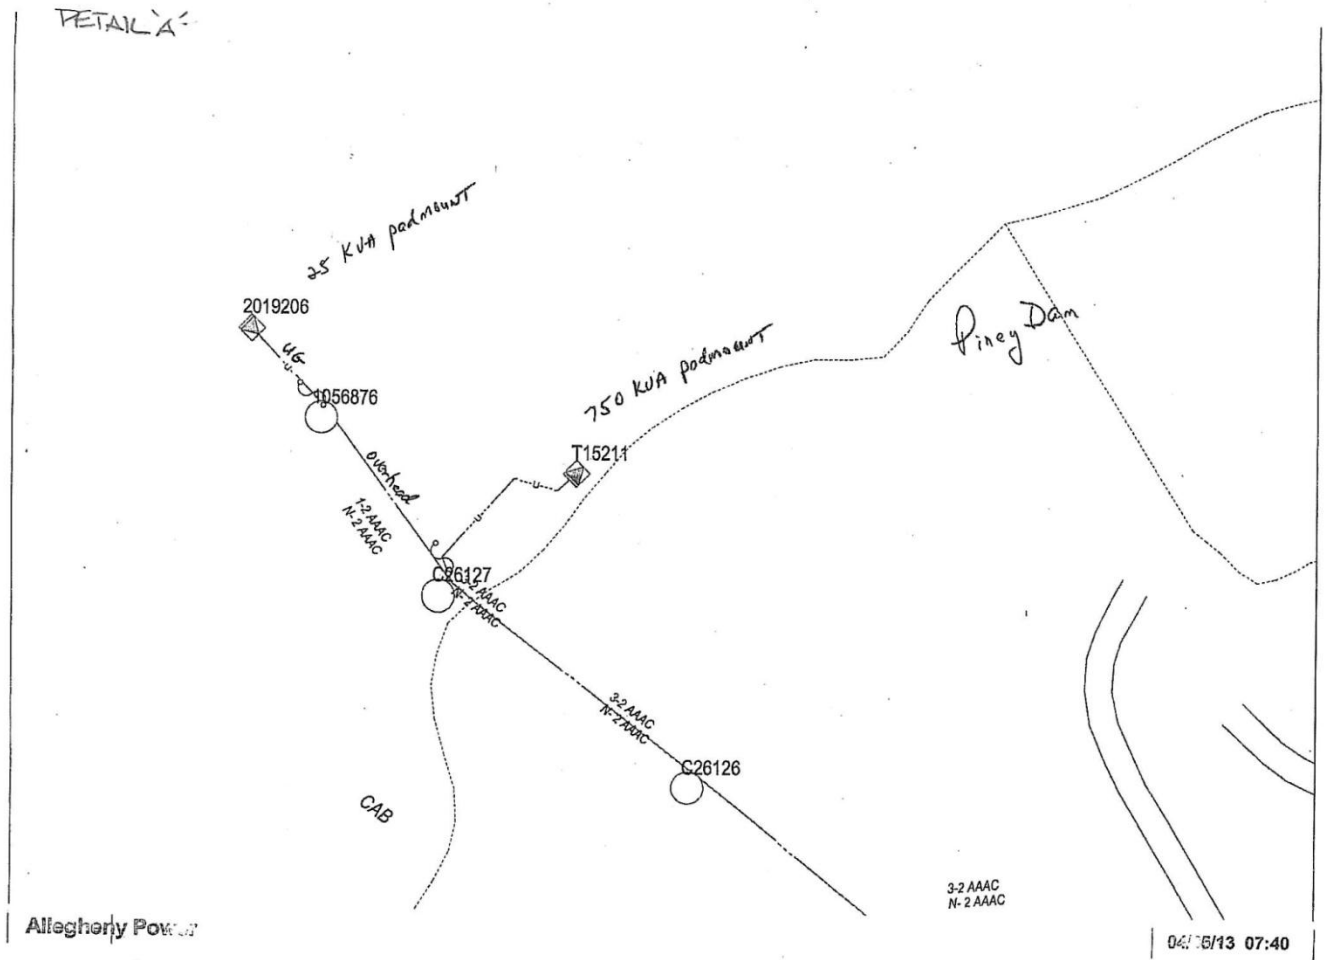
Detail of Potomac Edison drawing of the Piney Dam Pump House Connection.
